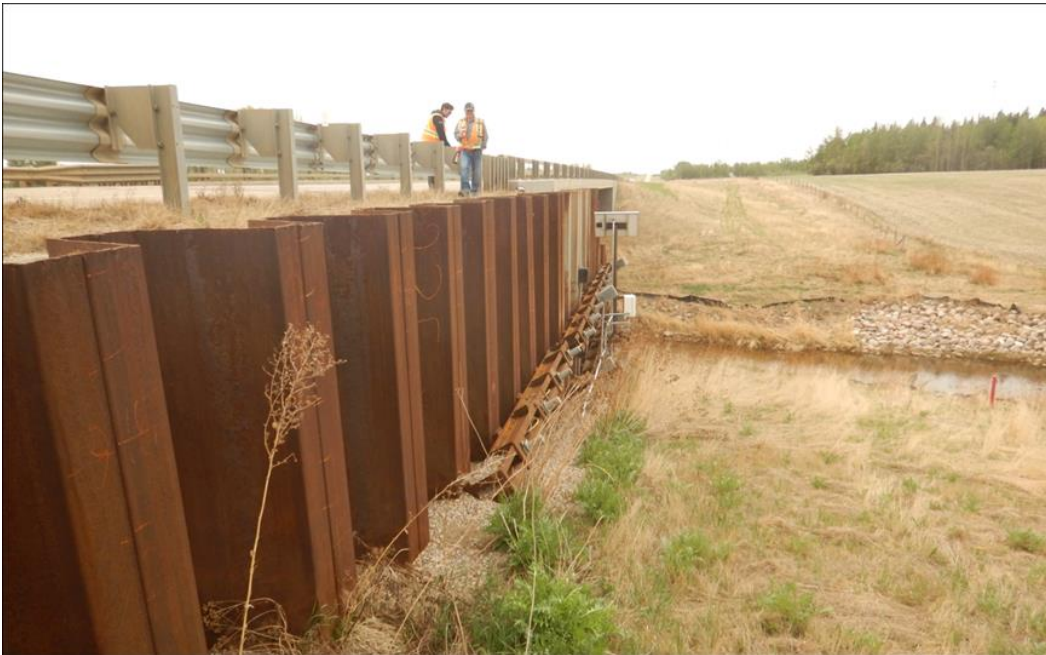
Sheet Pile Wall B with three rows of anchors supporting the highway embankment.
